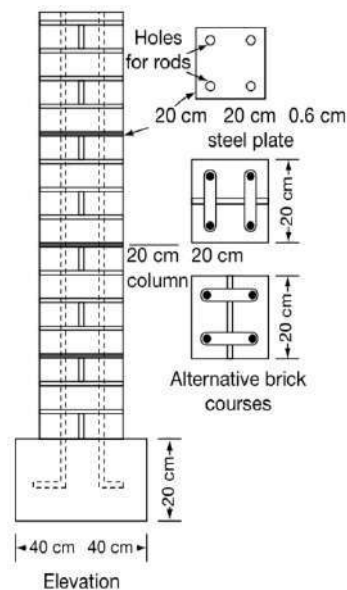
Reinforcement of brick masonry Column masonry lintels.
